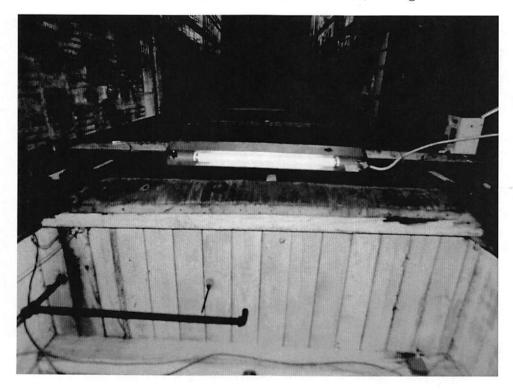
Interior, first floor Unit B, Elevator shaft.
